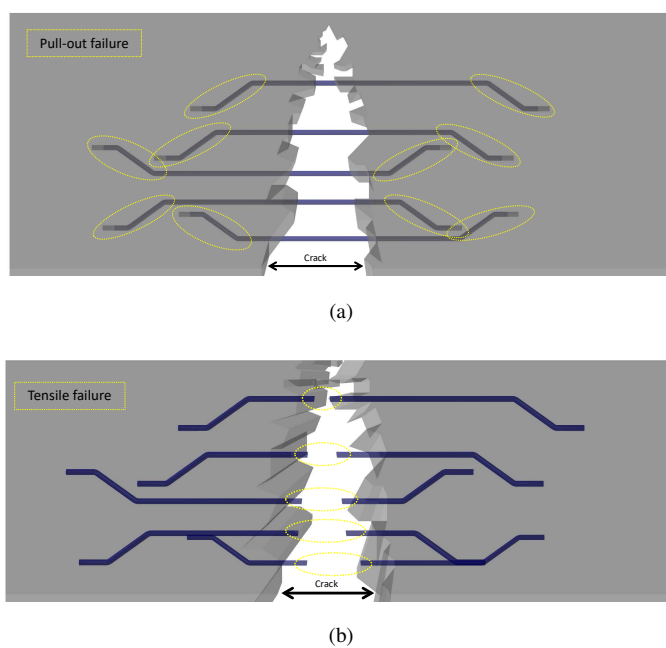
Schematic failure mechanisms in a fiber-reinforced concrete element with (a) pull-out, and (b) tensile failure.
